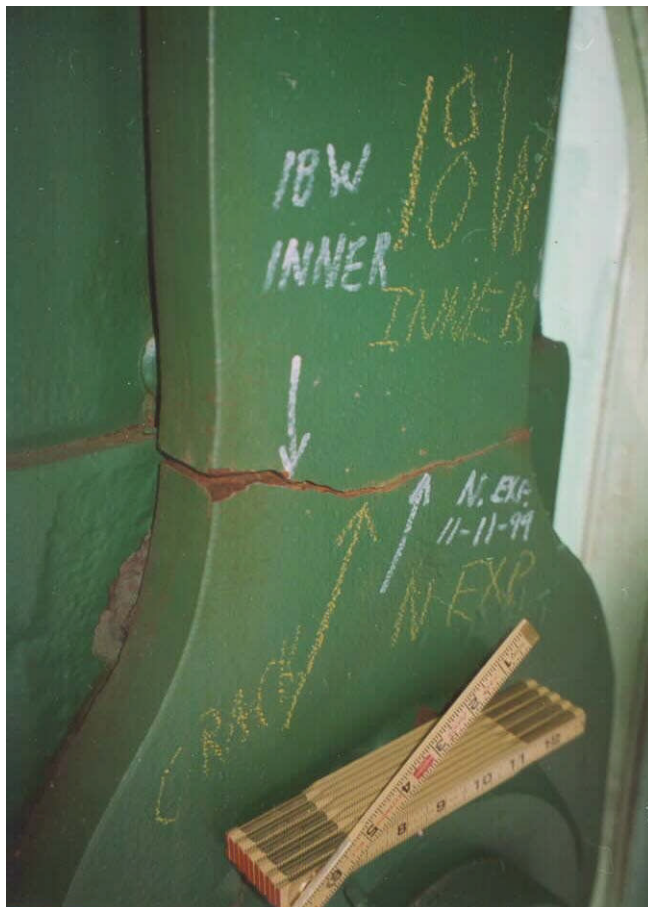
Cracked Forge Zone on an Eyebar
